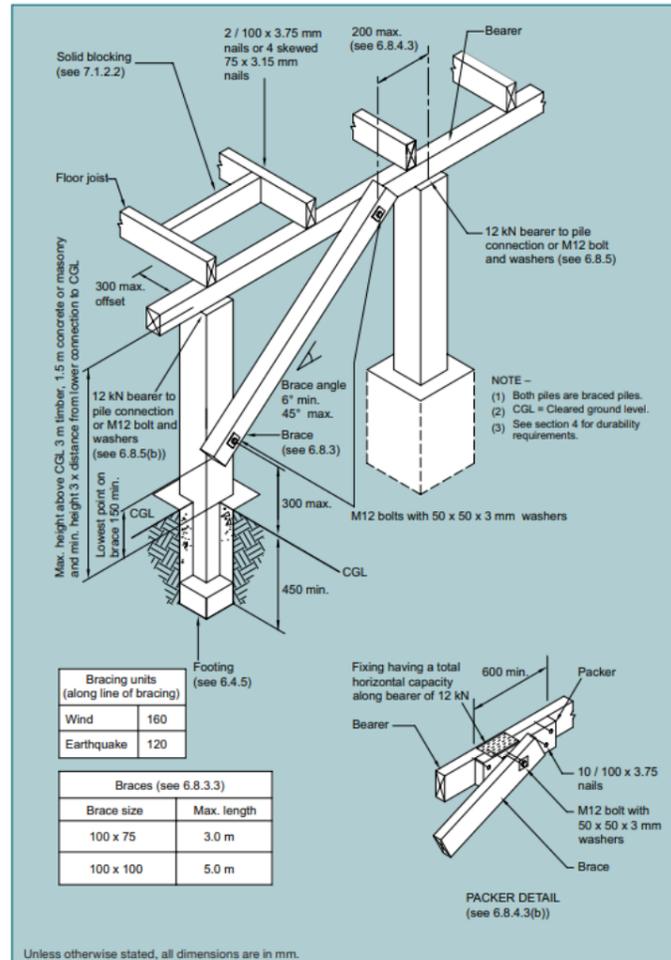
Braced pile system – Brace connected to bearer (see 6.8)
